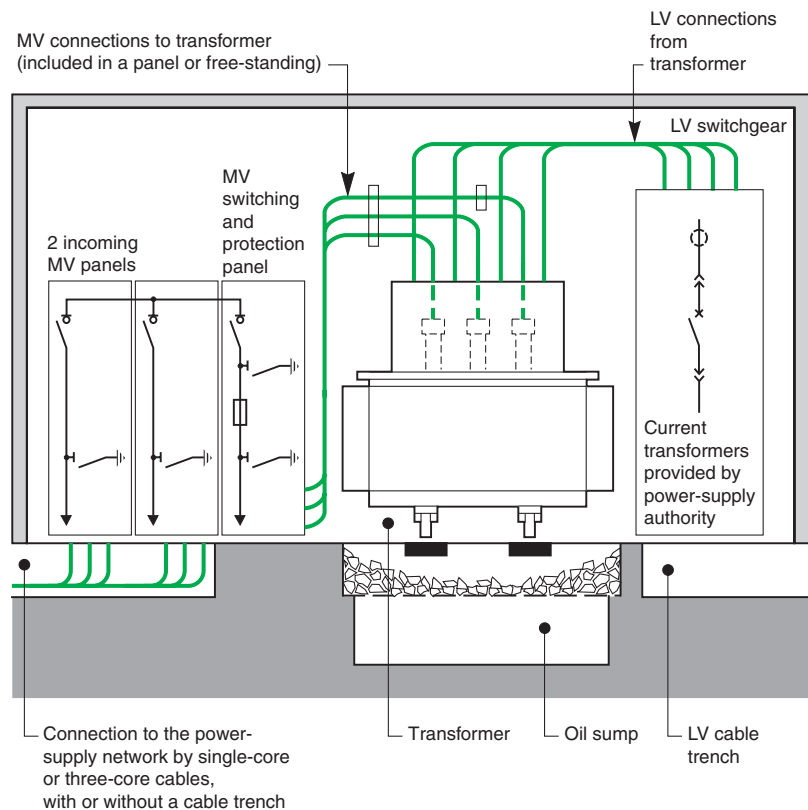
Typical arrangement of switchgear panels for LV metering
